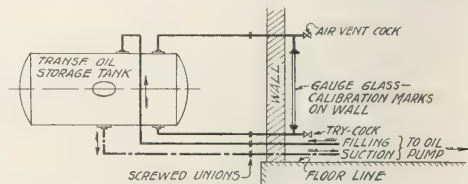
STORAGE TANK WITH AIR COCK AND GAGE GLASS INSIDE OF POWER HOUSE
